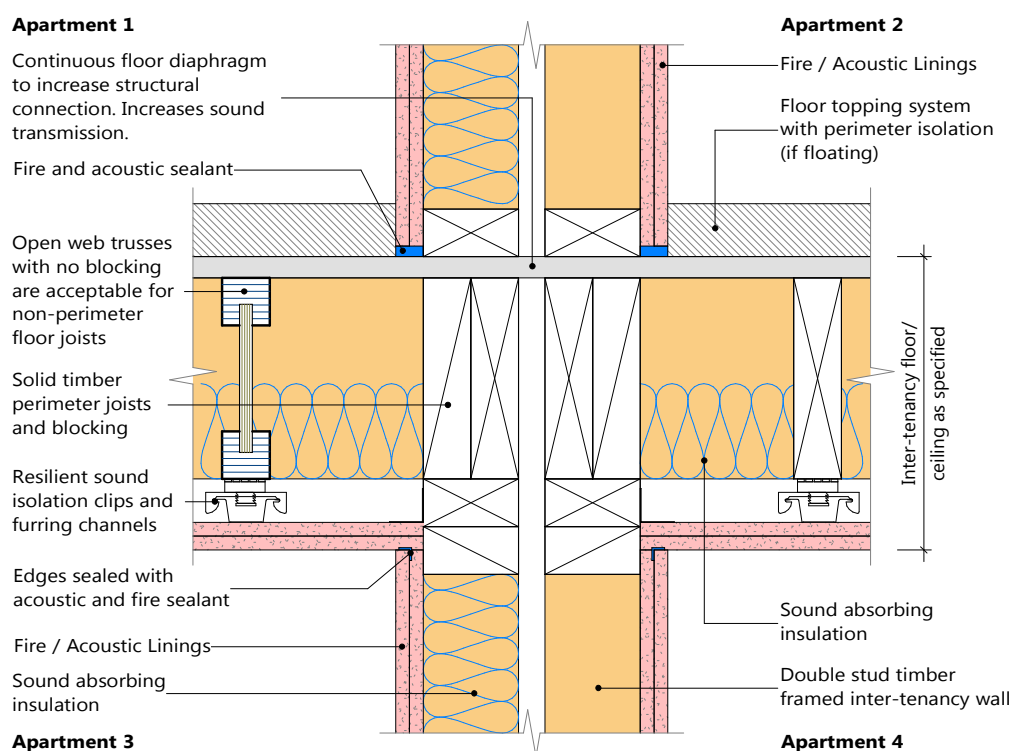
Floor junction detail with continuous diaphragm- joists parallel to inter-tenancy wall
